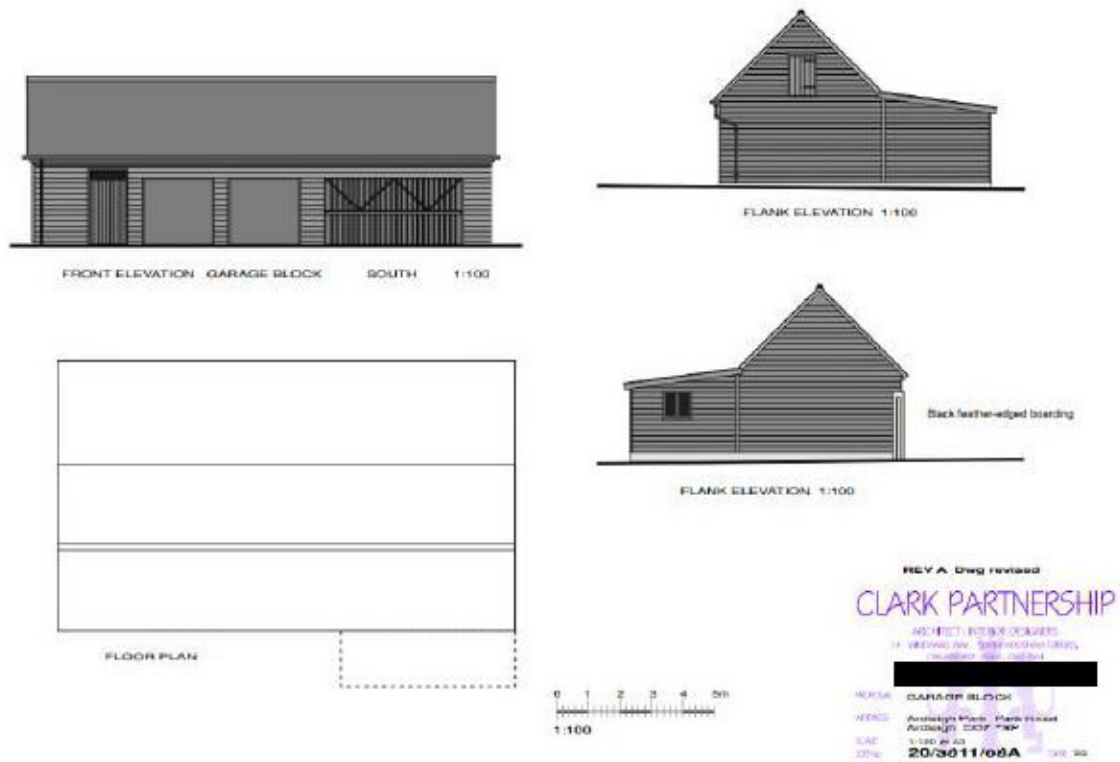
existing (and prior) to removal of pitched roof lean-to to garage.
